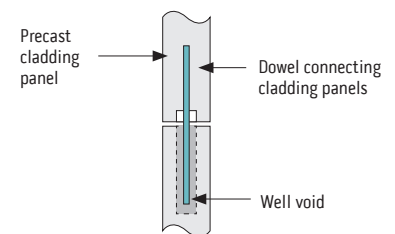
DOWELLED CONNECTION IN STACKED CLADDING SYSTEMS
